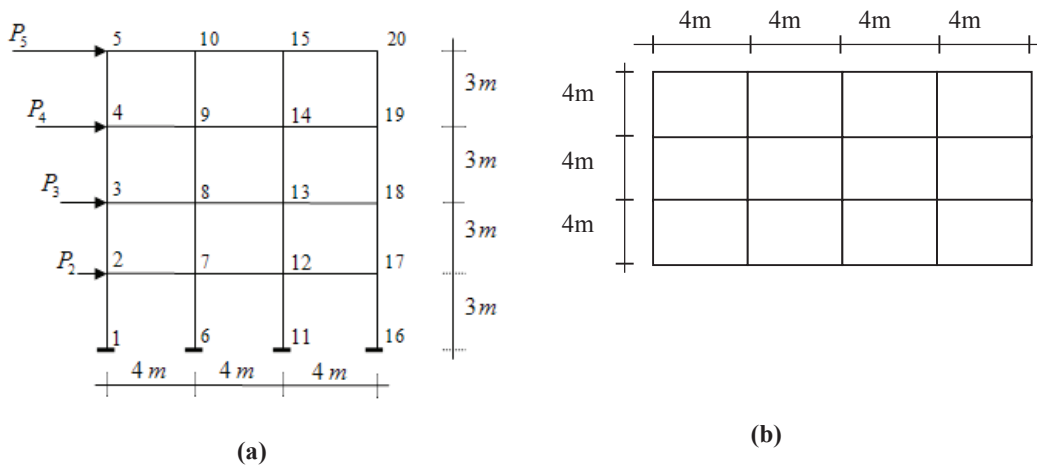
Four-storey two-bay reinforced concrete structure; (a) Vertical elevation, (b) Plane view.
